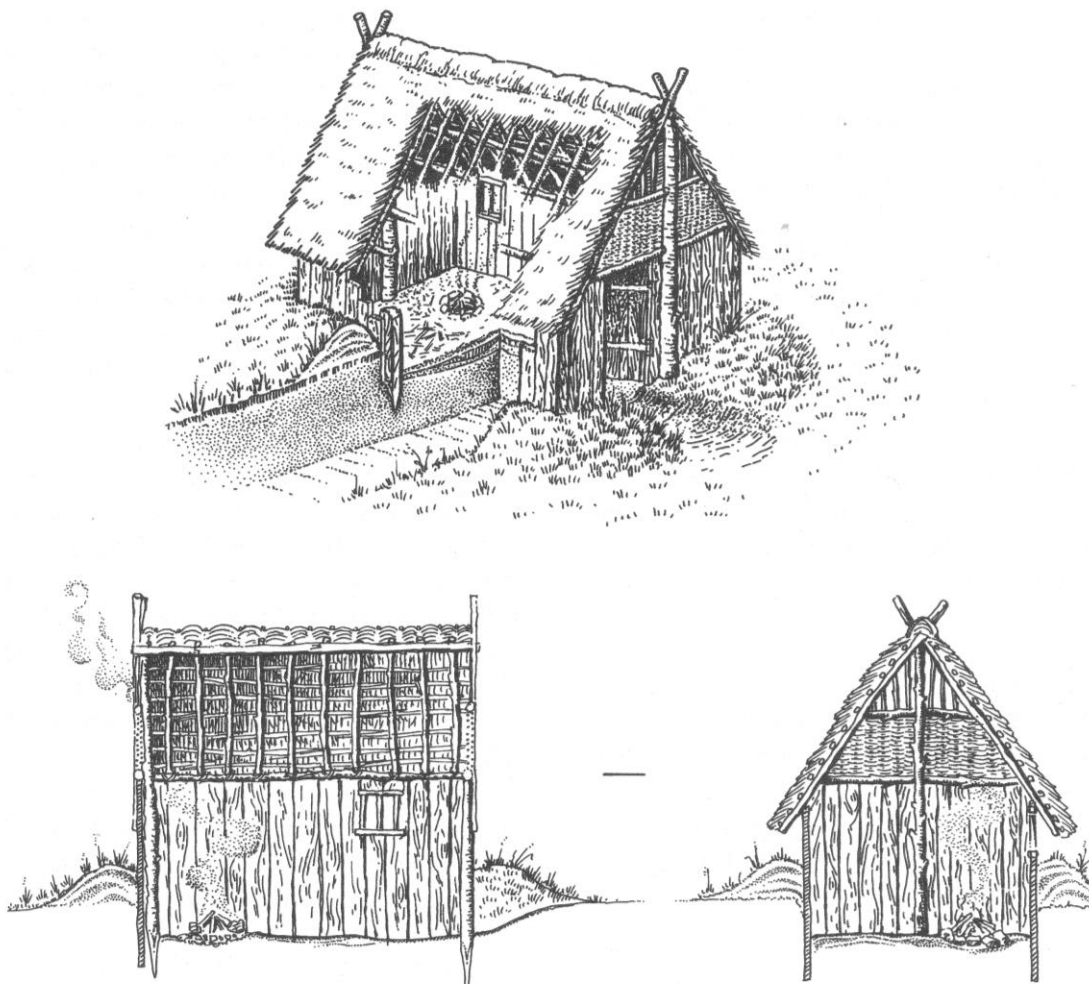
A reconstruction of a sunken-feature building. Note the single, central post in the end walls. (Illustration taken from Adkins, et al. 2008).
